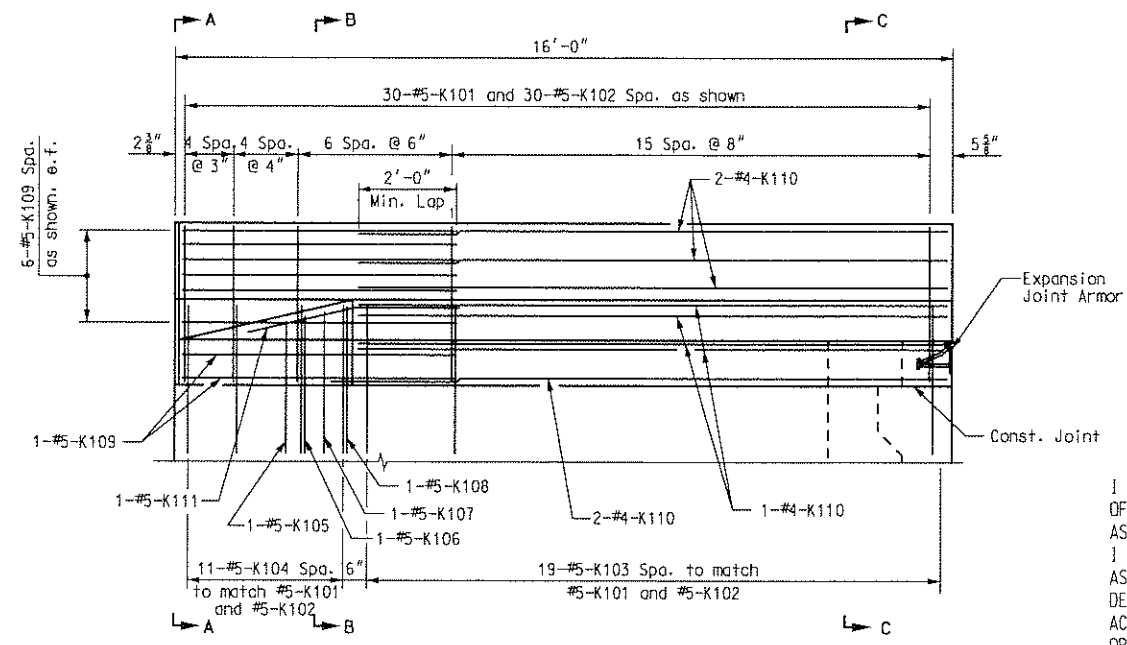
DETAILS OF SAFETY BARRIER CURB AT CLOSURE POURS
